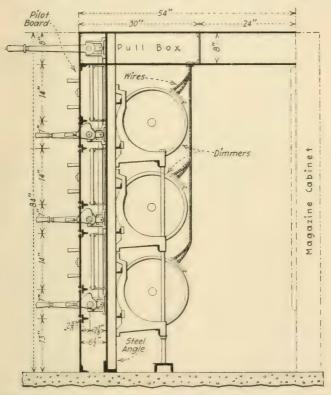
Side view of pilot board for Indiana Theatre, Terre Haute, Ind., showing location of dimmers, pull-box and magazine cabinet. (Frank Adam Electric Co.)
